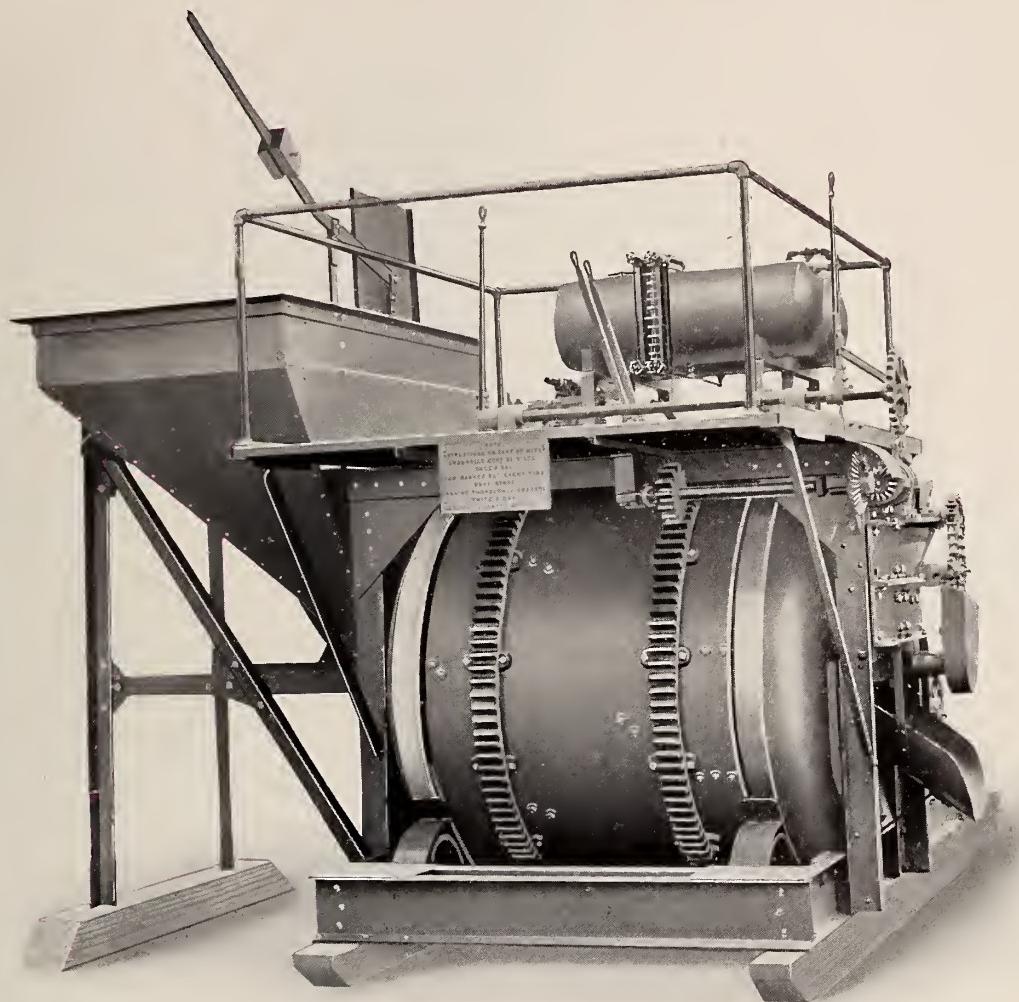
London Concrete Mixer No. 42-S, fitted for Electric Motor, equipped with Power Discharge mechanism.
